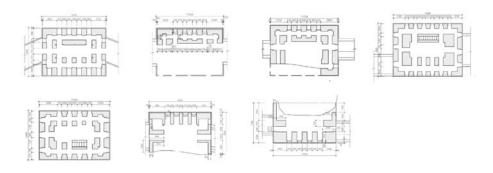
Typology 3-6: Floor Plan of No. 5, 21, 28 33, 43, 82, 94
